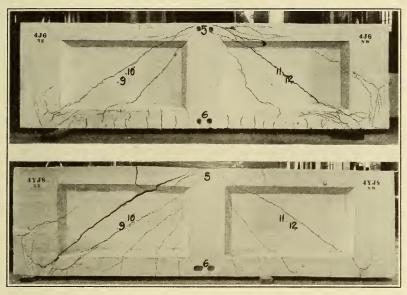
Failure of beams 4J6 and 4YJ8 with 6 and 8.5 inch webs and no web reinforcement
